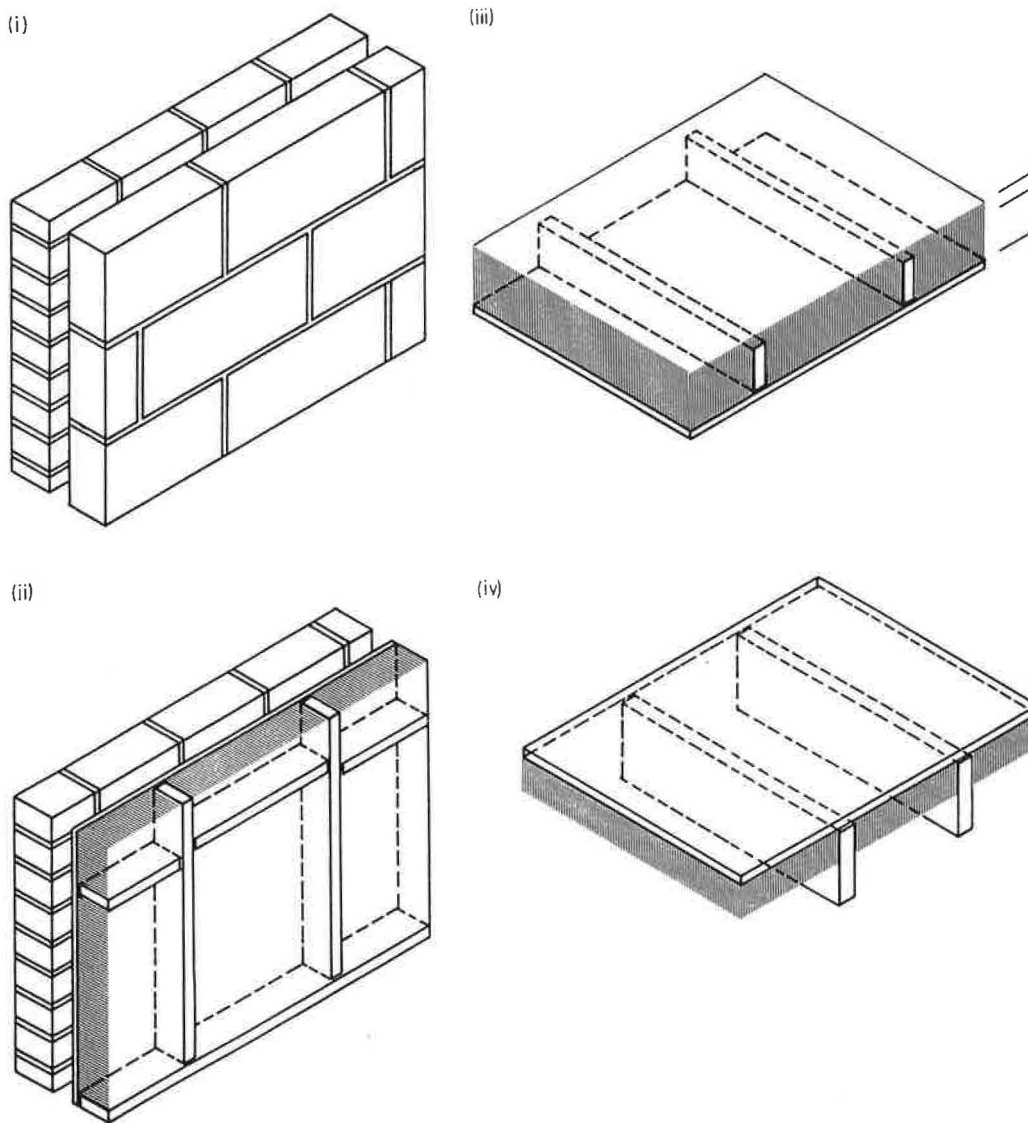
Examples of thermal bridging in house construction (i) Mortar bridging in a masonry cavity wall (plaster finish not shown but included in calculation) (ii) Bridging in a timber framed wall (plasterboard finish not shown but included in calculation) (iii) Partial bridging by ceiling joists (iv) Bridging by timber floor joists
